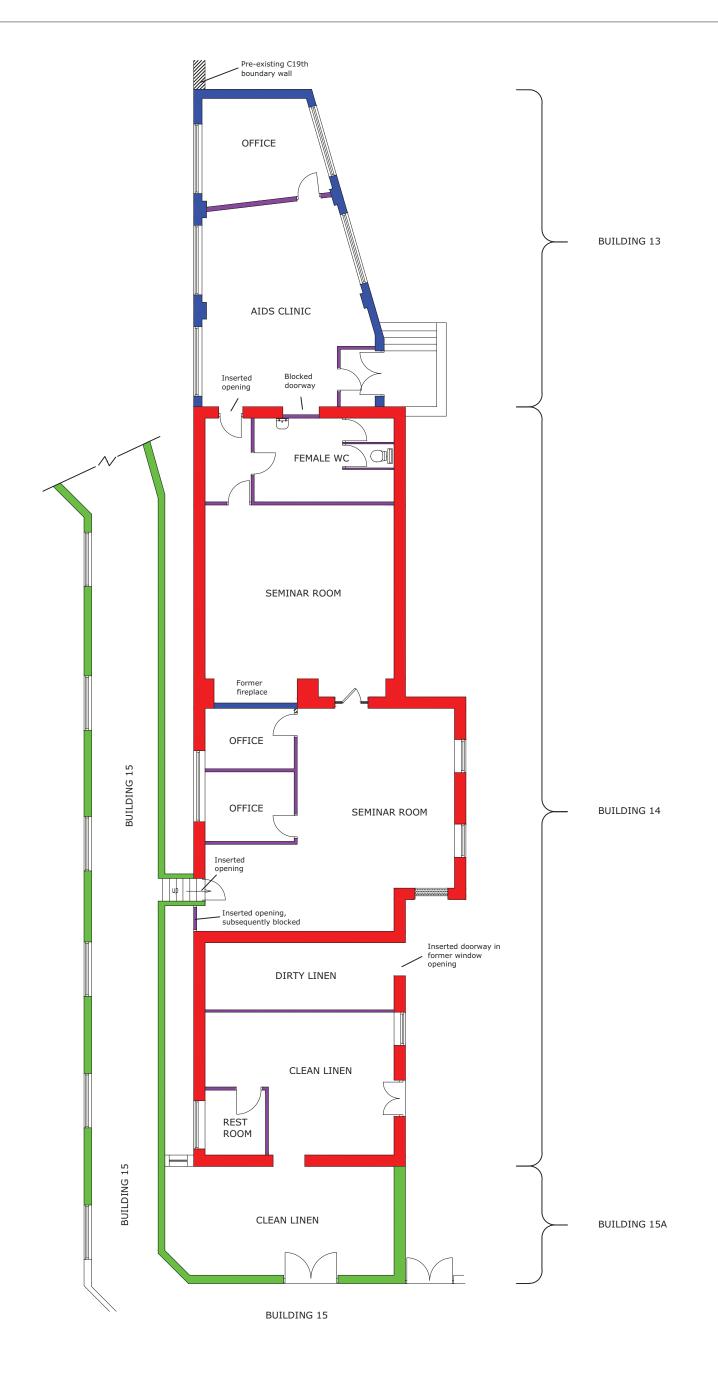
Former laundry (B.13, 14, and 15a) - ground floor plan
